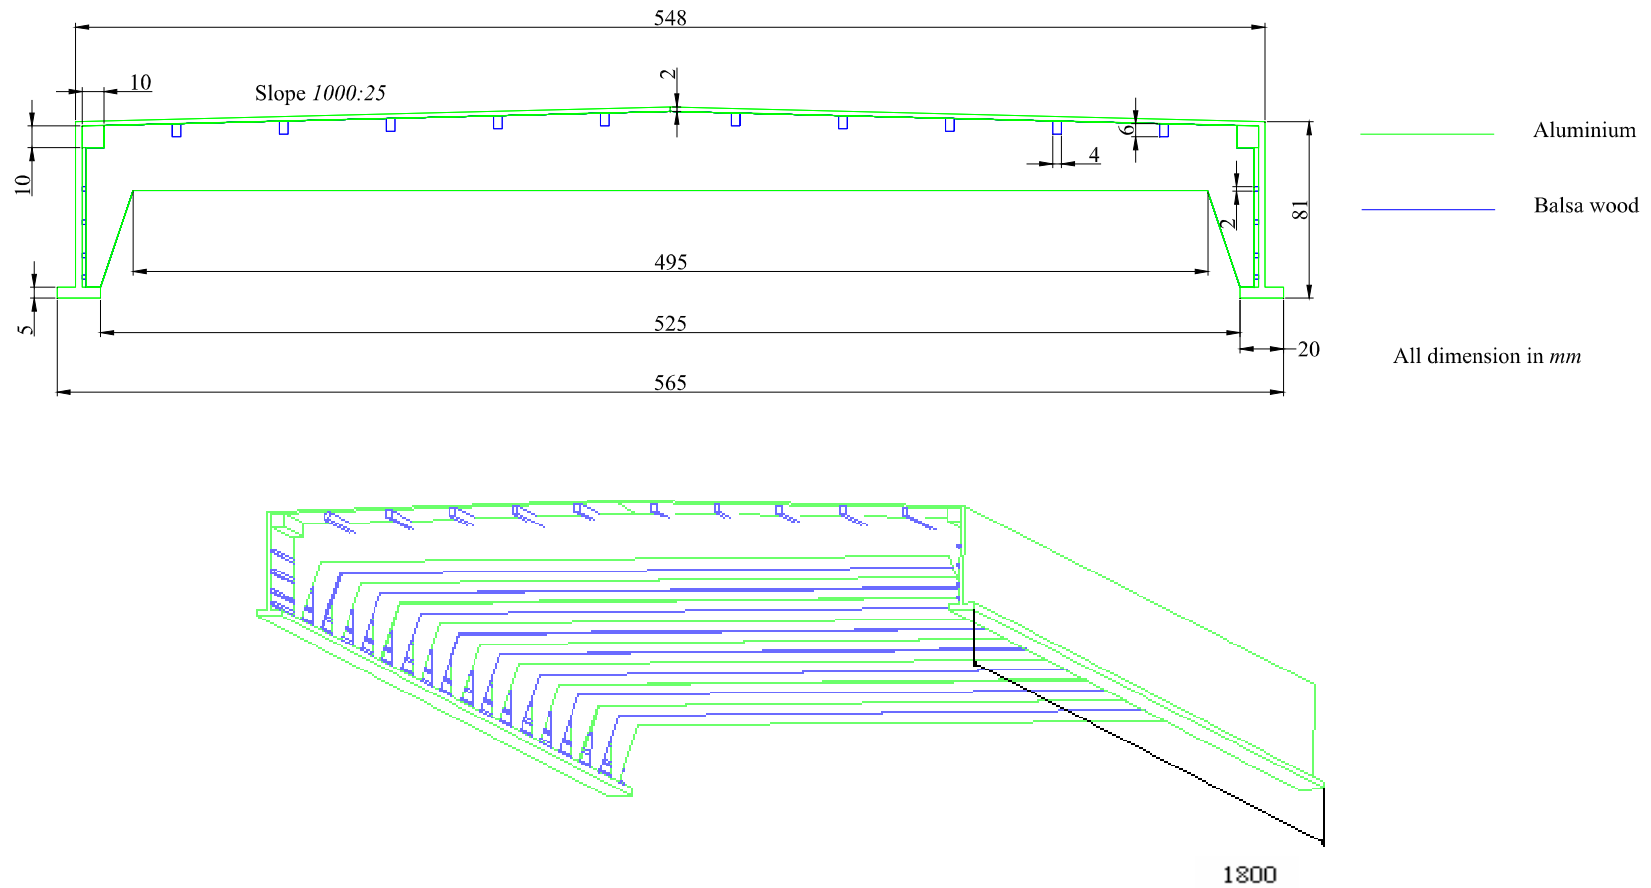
Dimensions of a 1:40 scale section wind tunnel model of Kessock Bridge.
